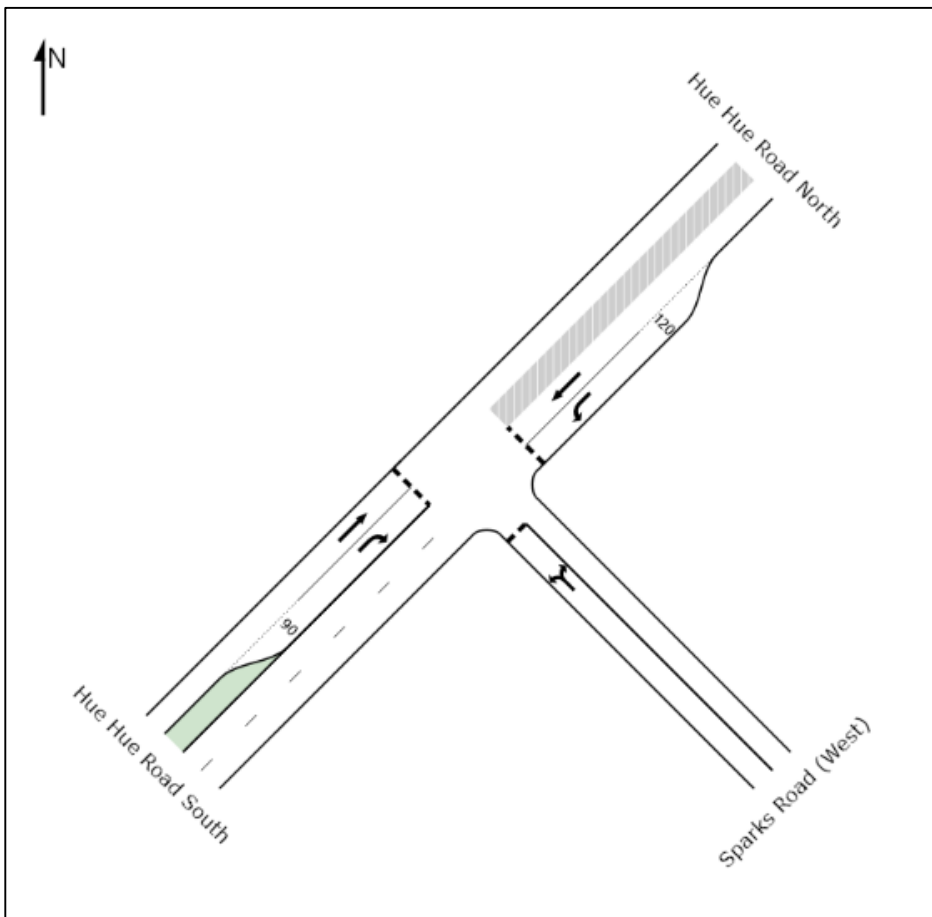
Intersection Layout on Sparks Road (West) and Hue Hue Road
